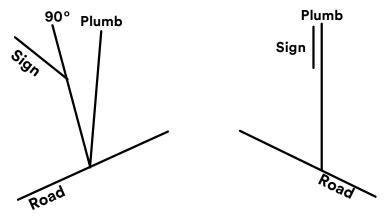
Vertical sign rotations for (left) uphill road grade, and (right) downhill road grade.
